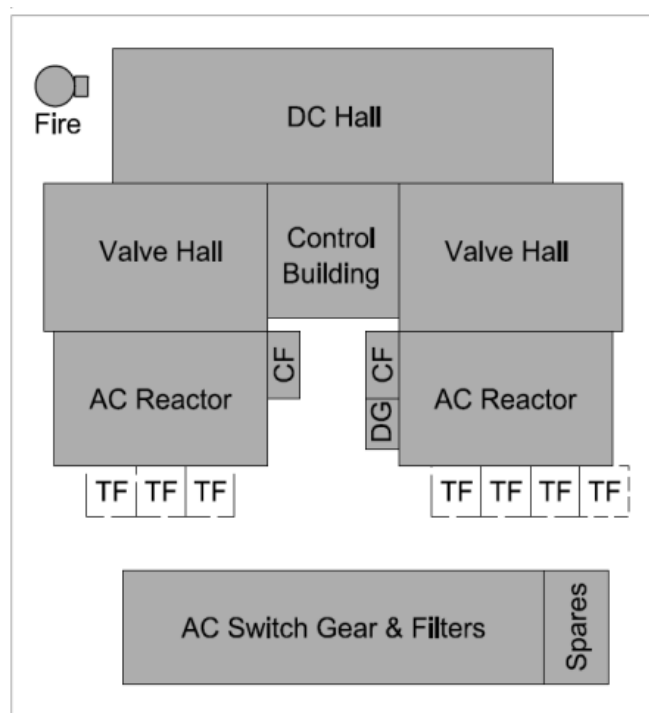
Conceptual layout of a 1,400 MW bipole
